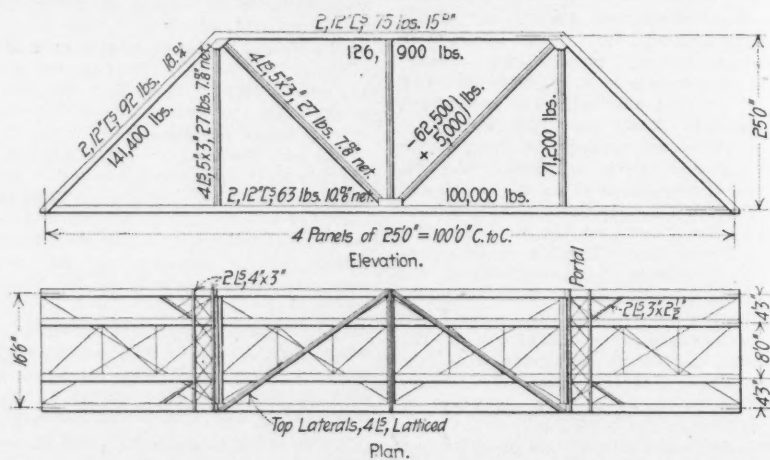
WROUGHT-IRON RIVETED TRUSS RAILWAY BRIDGE OF 100-FT. SPAN DESIGNED IN 1891.
